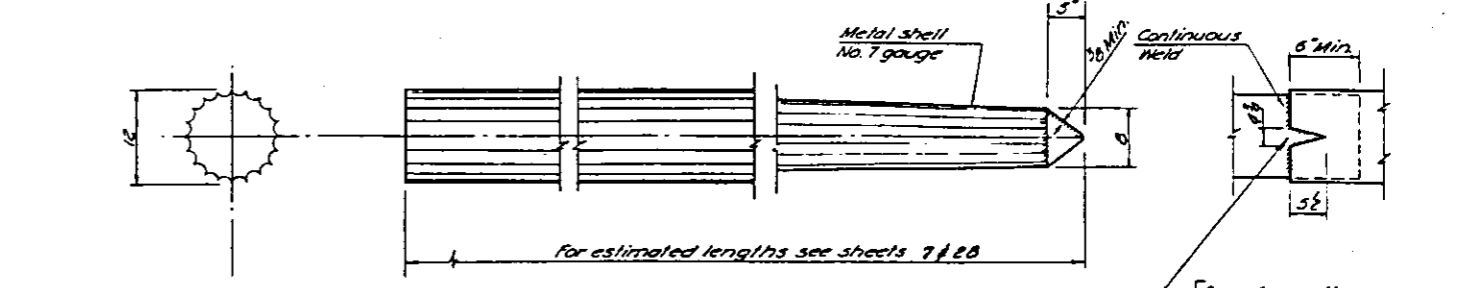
DETAIL OF CYLINDRICAL STEEL SHELL FOR CAST IN PLACE CONCRETE PILES
